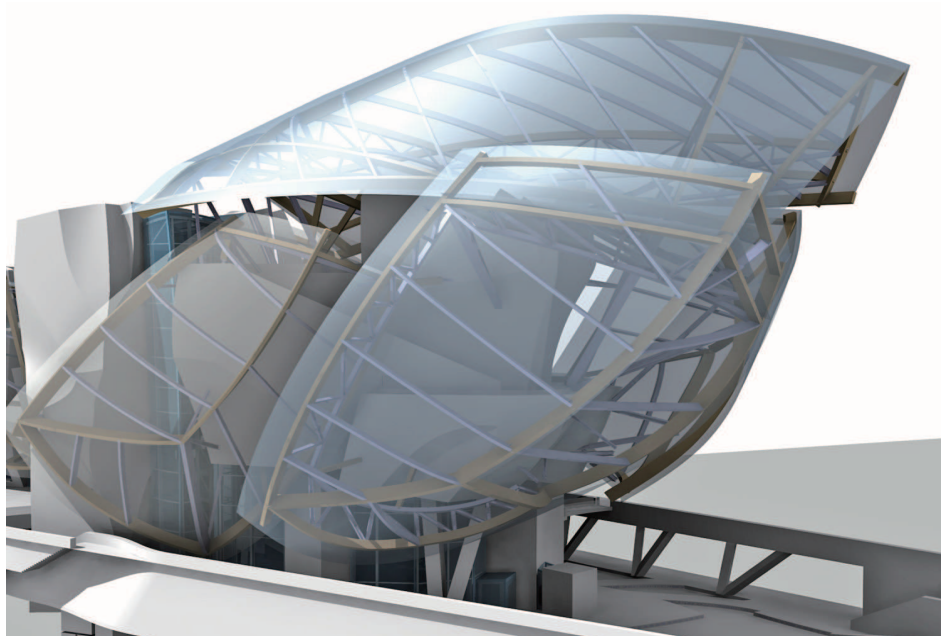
LOUIS VUITTON FOUNDATION OVERVIEW PHOTO 2
